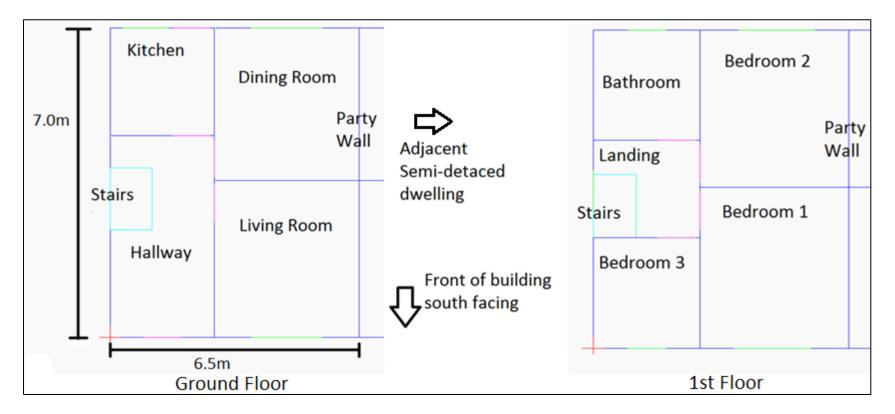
Base Case 1965-1980 semi-detached dwelling typical floor plan
